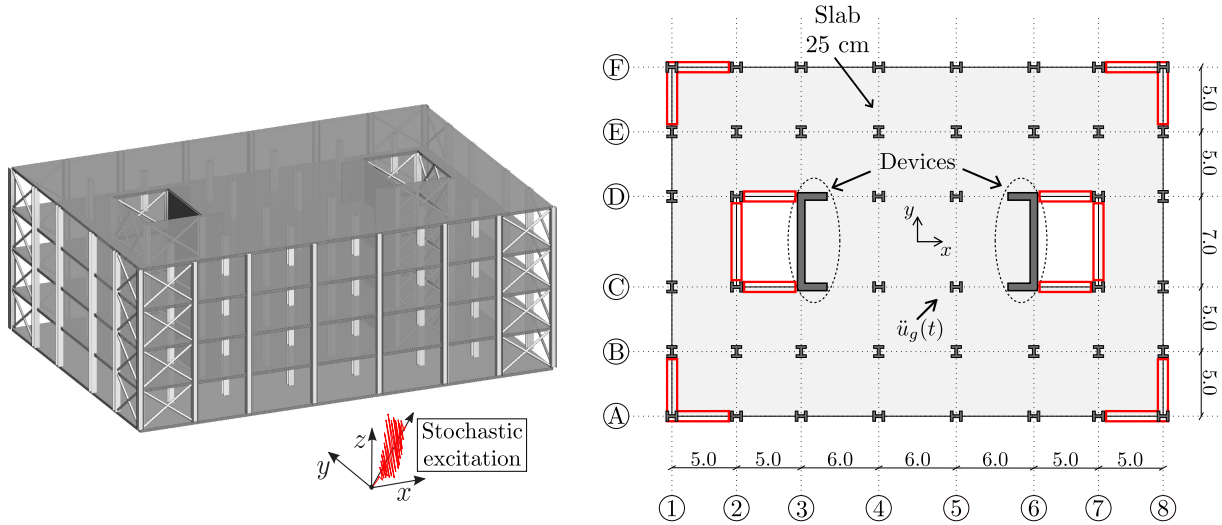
Isometric (left) and plan (right) view of the structural model. Example No. 3.
